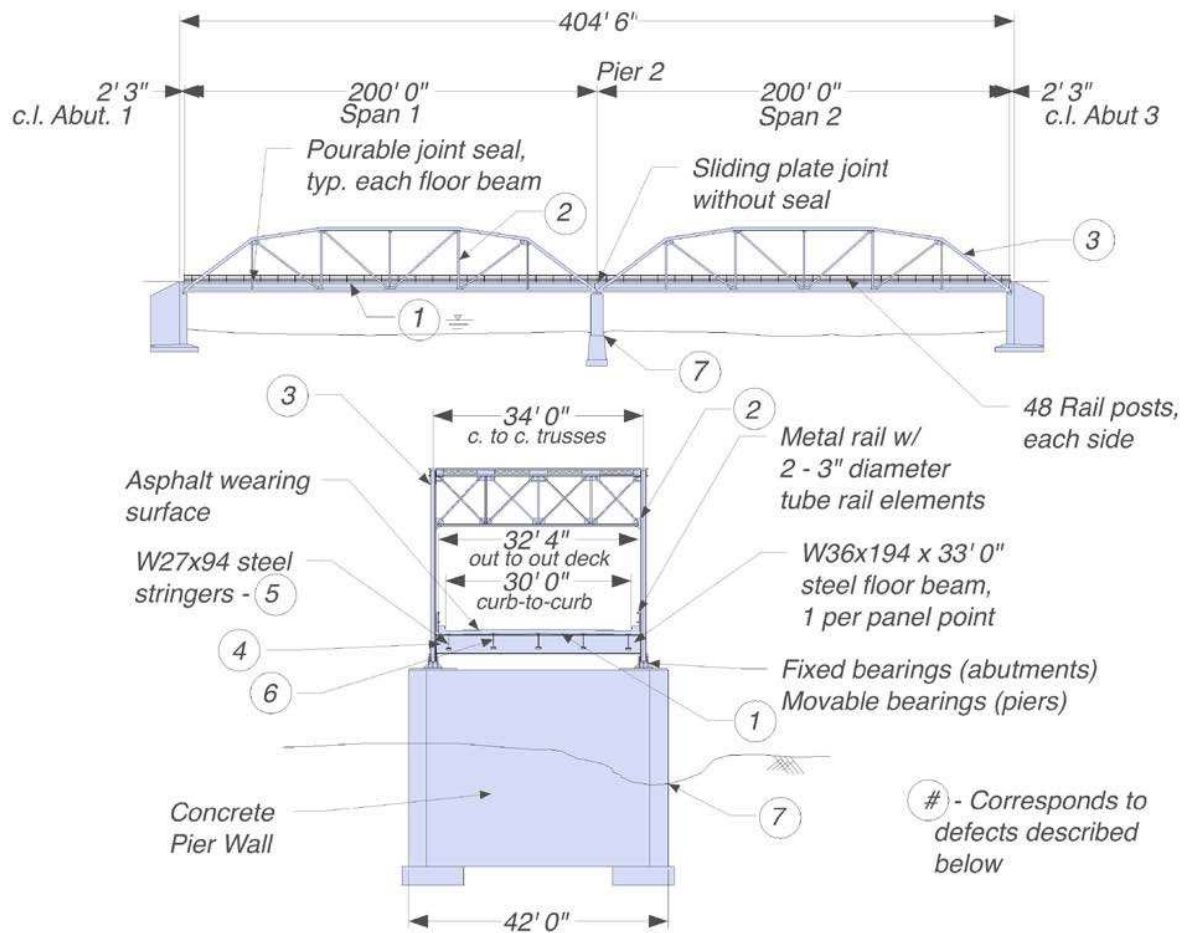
Elevation and Typical Section for Steel Truss Bridge Example
